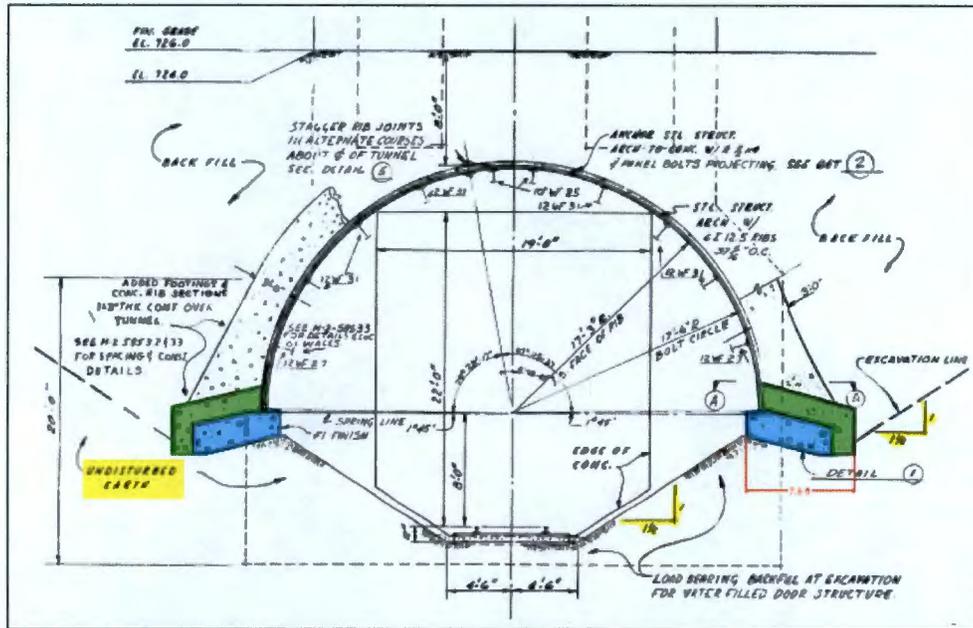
Cross-sectional view of Tunnel 2 as-built footing geometry
